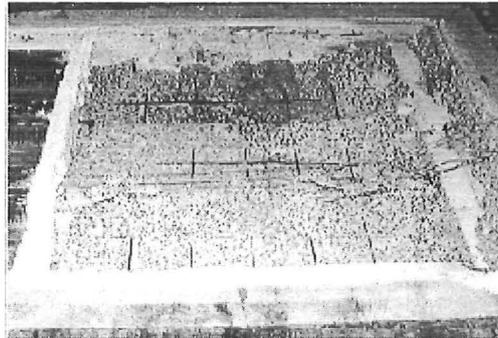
Damage caused to ribbed slab with no polypropylene fibres caused by spalling. (exposure time: 1 hour 30 minutes)
